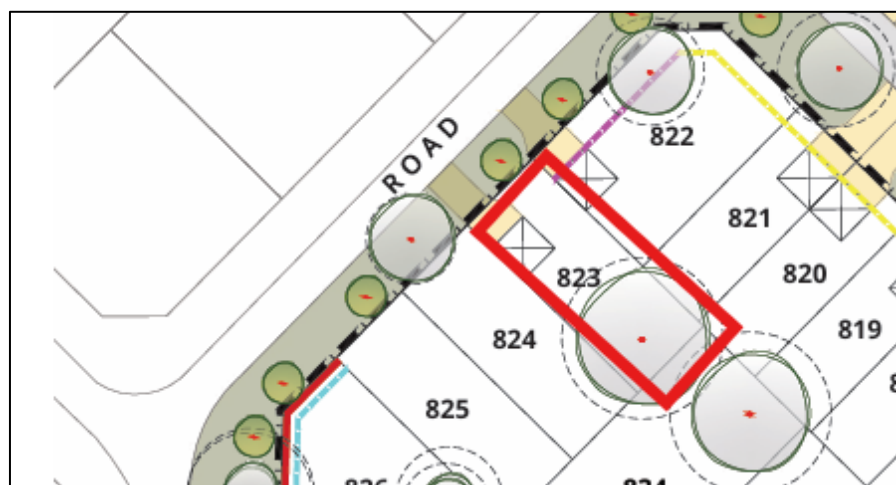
Tree Protection Zone which overlaps adjoining properties
